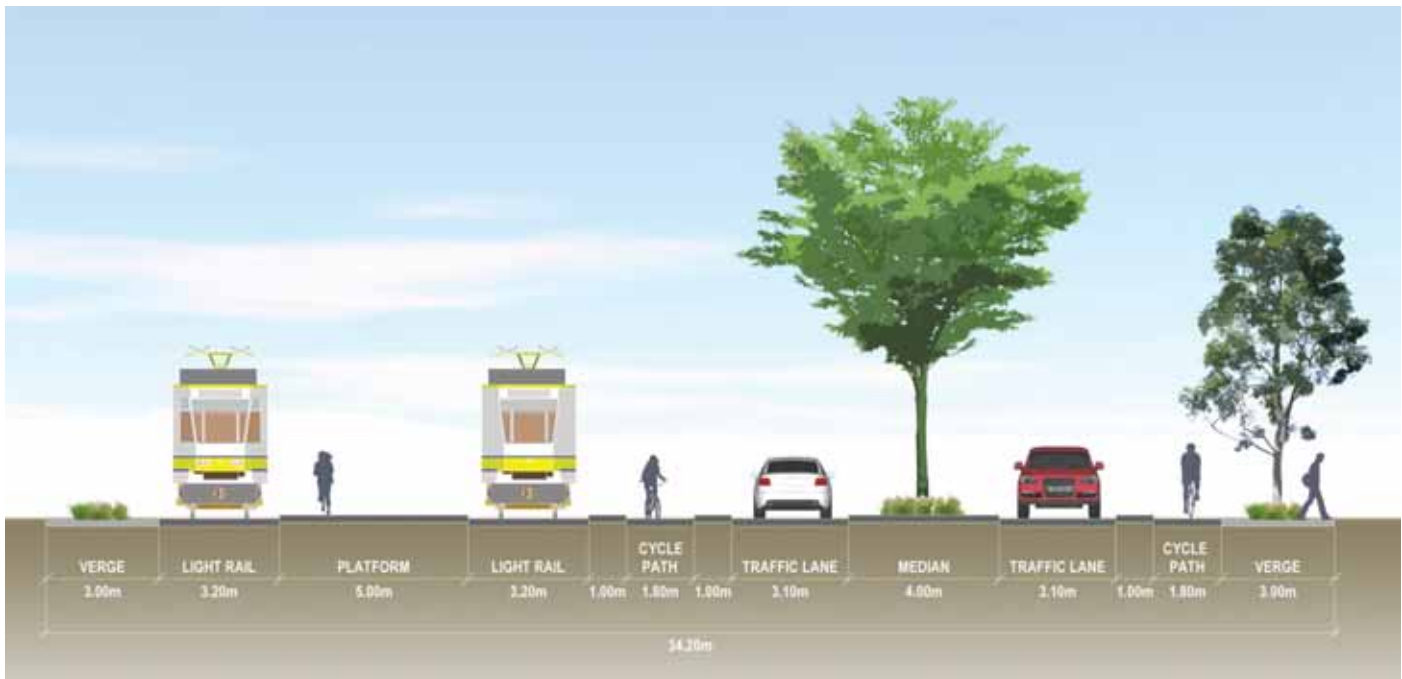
Howe Street Conceptual Cross Section (between Stephenson Avenue and Ellen Stirling Boulevard)
